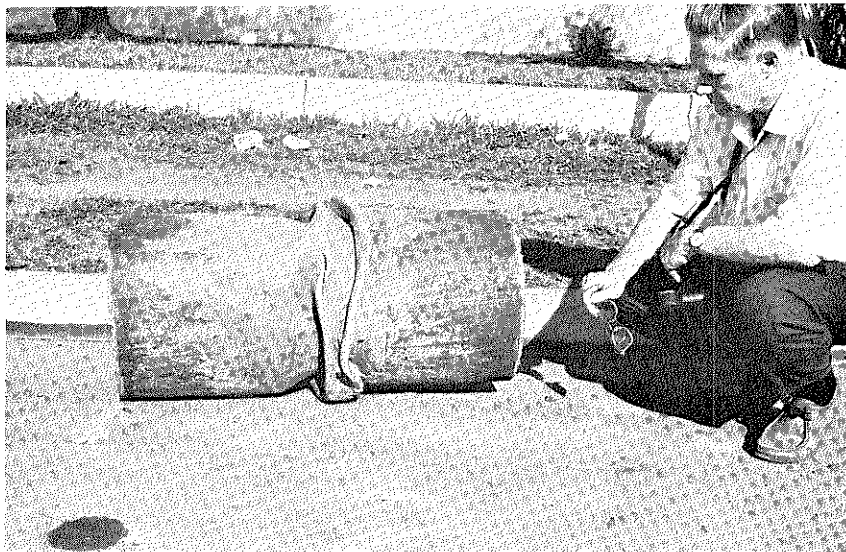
Extensive ground deformation in the general region of surface faulting damaged underground pipes. The pipe shown is a 16-in. diameter, 1/4-in. thick, gas pipe that was buckled by compressive deformation. This pipe had been buried 6 ft. beneath the street.
